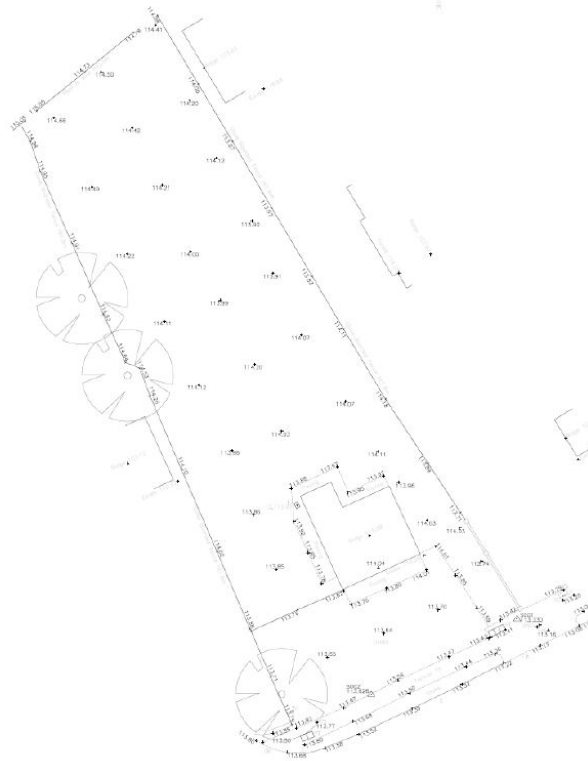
Topographic survey. From design & access statement (HSP Architects 2025)
